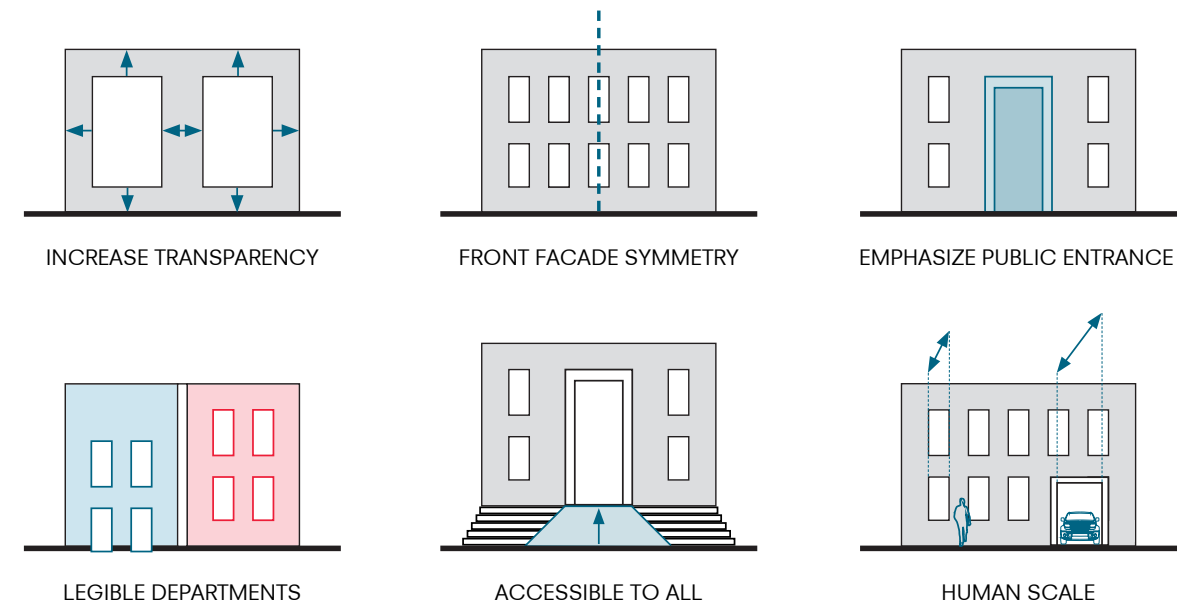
Architectural principles to improve building approachability (own diagrams)
